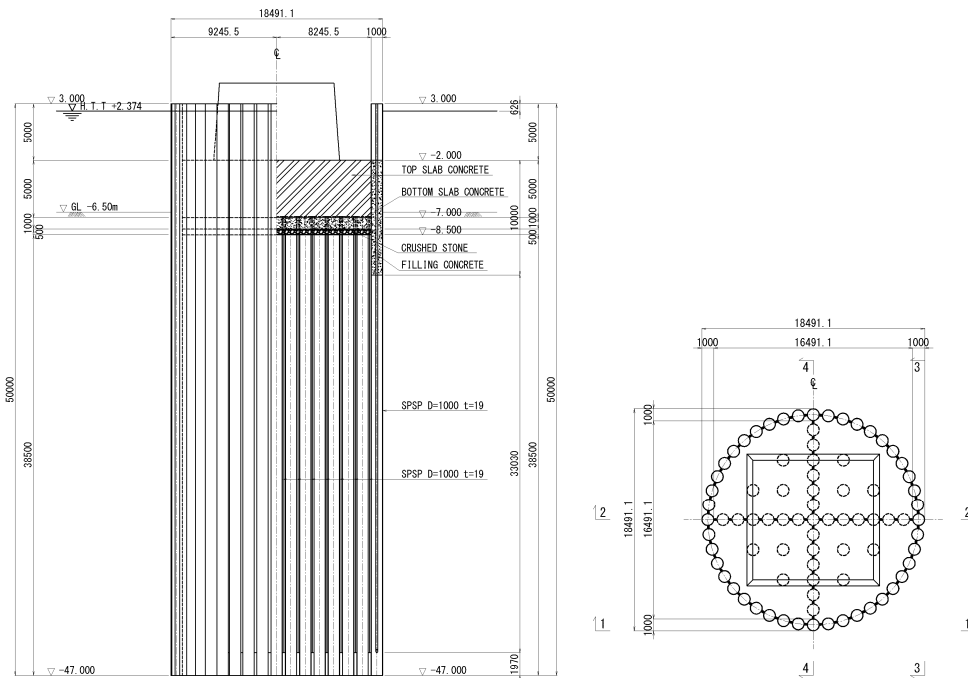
Minimum Dimensions of In-river Pier (Superstructure: Arch Bridge)
